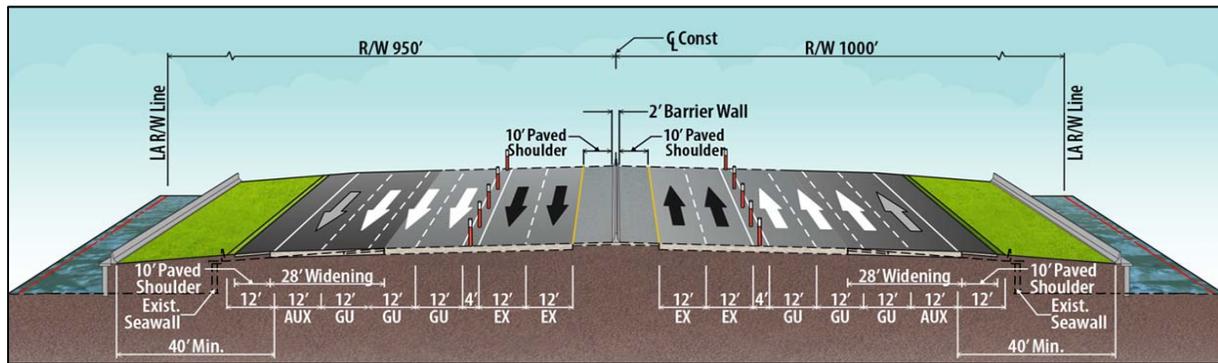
I-275 Preferred Mainline Master Plan Build Alternative Typical Section from Roosevelt Boulevard to south of 9th Street North (Segment C-MP2)
